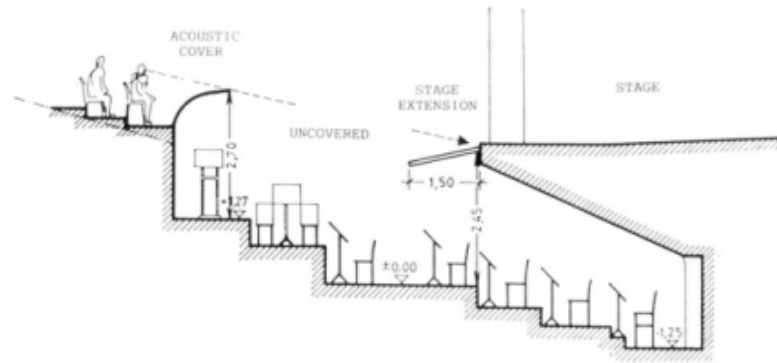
Layout of the orchestra pit of Bayreuth Festspielhaus
